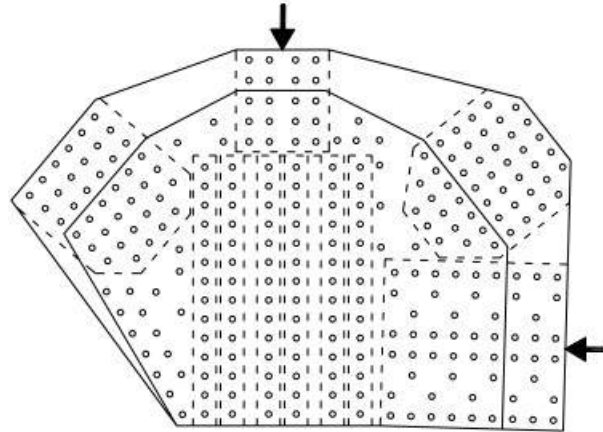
Example Showing Truss Vertical and Chord Members in Compression that Do Not Require a Partial Shear Plane Check
